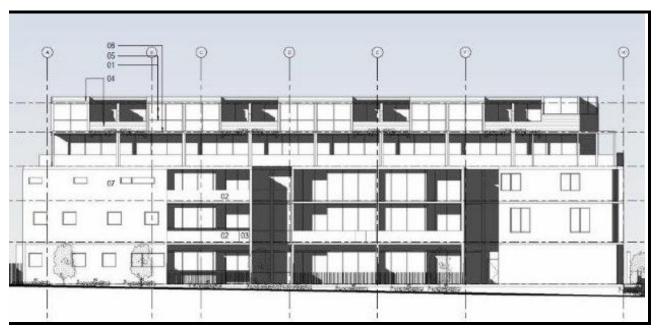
Proposed Western Elevation (Source: Brewster Murray, 13/10/17)
